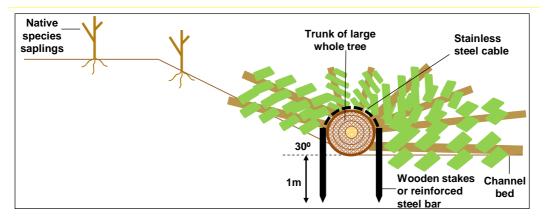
Cross-sectional view of large tree placement secured using steel cabling attached to bank top wooden stakes or steel reinforced bar
